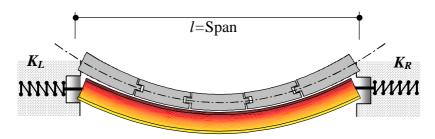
Restrained beam supporting a pre-cast concrete slab
